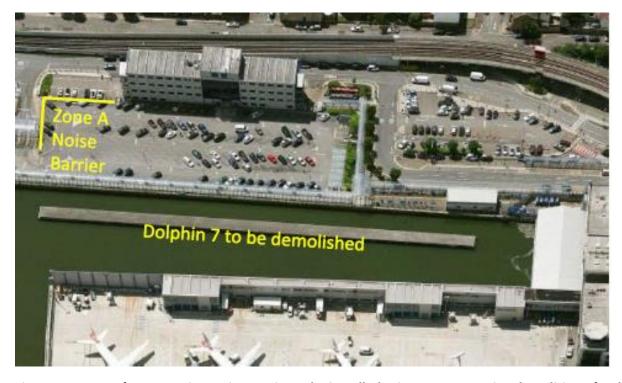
Extent of Construction Noise Barrier to be installed prior to commencing demolition of Dolphin 7
